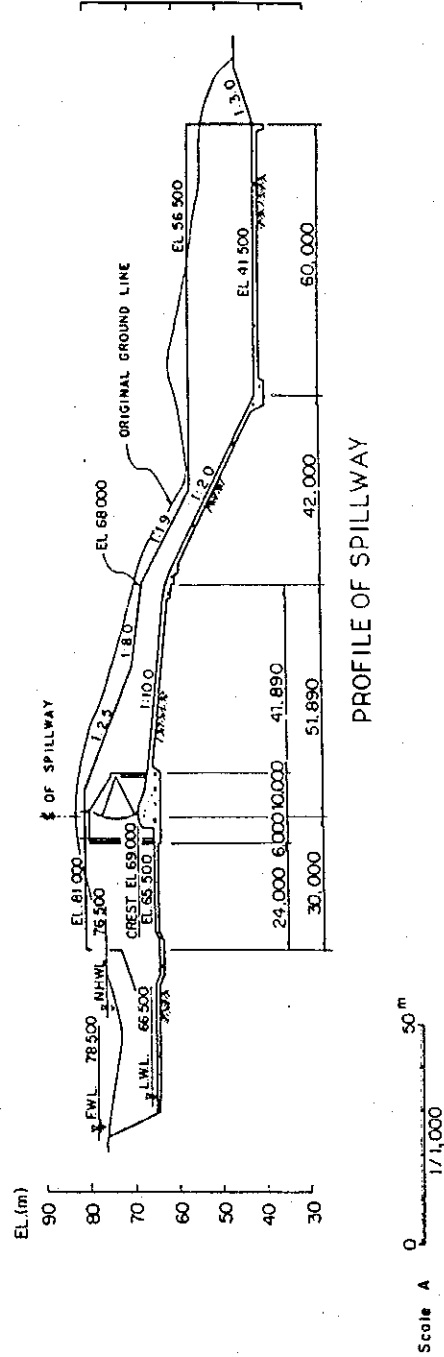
CROSS SECTION AND SPILLWAY OF CILAWANG DAM
